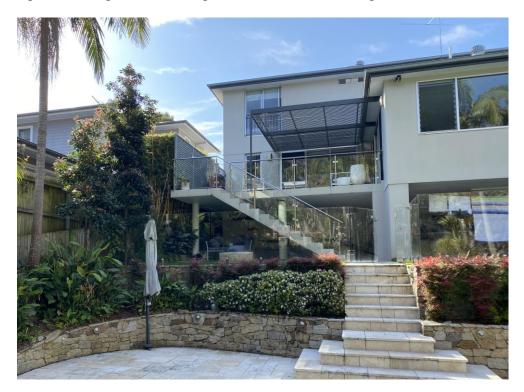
Looking east towards the rear ground floor level and proposed location of the modified roof form over the alfresco area
